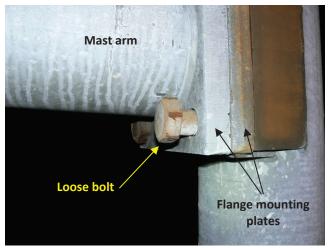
Loose bolt at flange mounting plates of mast arm to pole connection
